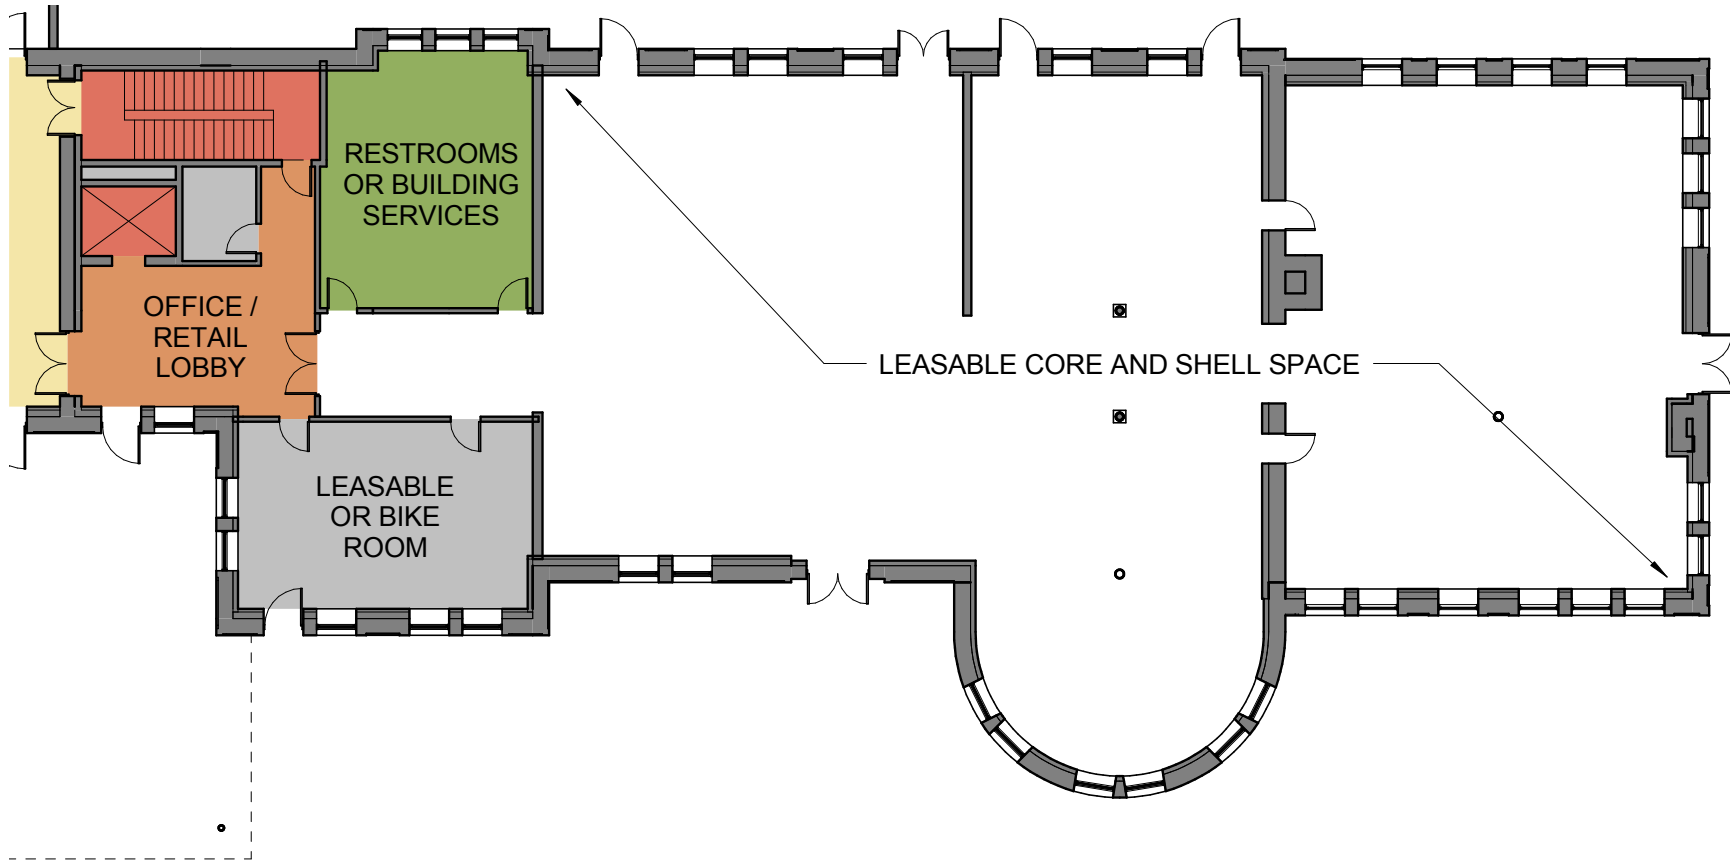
South Main Floor Leasable Spaces Alternative B - Restaurant
